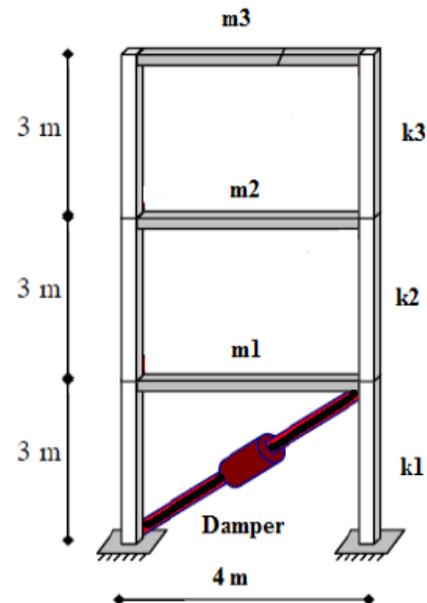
BUILDING WITH PASSIVE DAMPER AT
